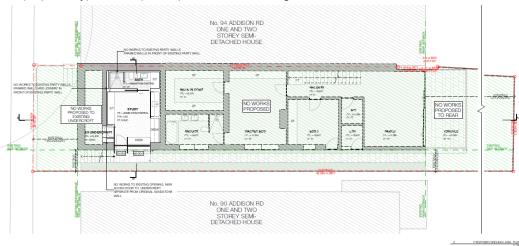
Proposed Floor Plan (Lintel Studio 2020)
